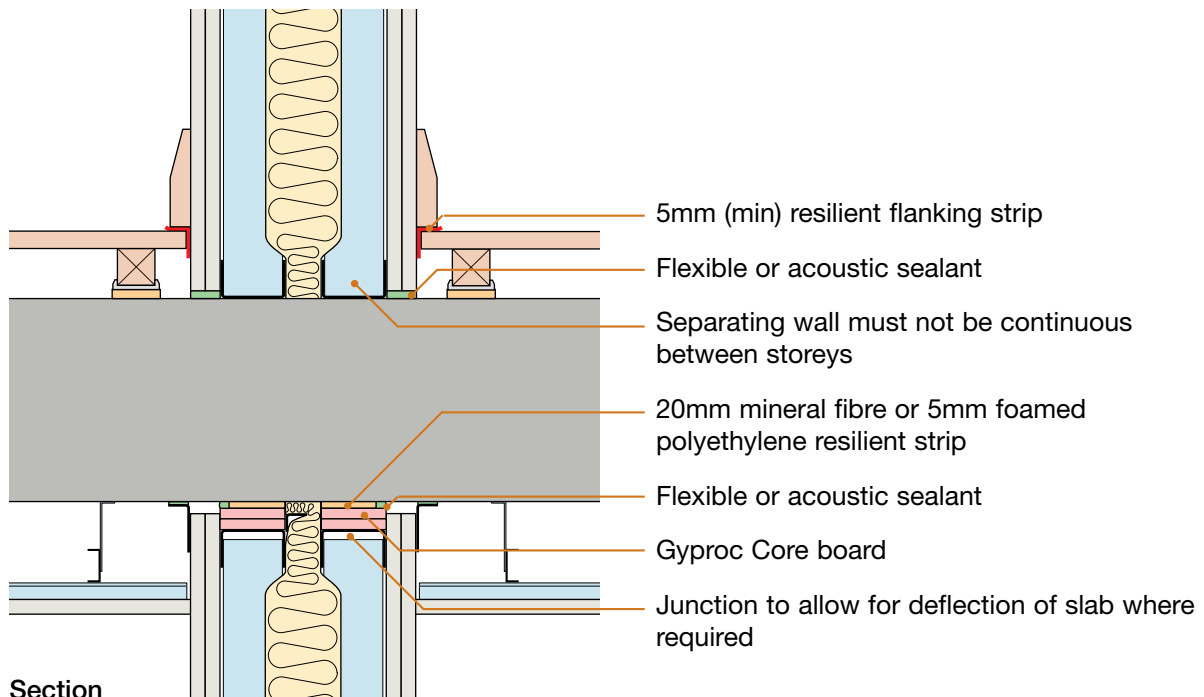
type floating floor treatment and metal ceiling treatment
